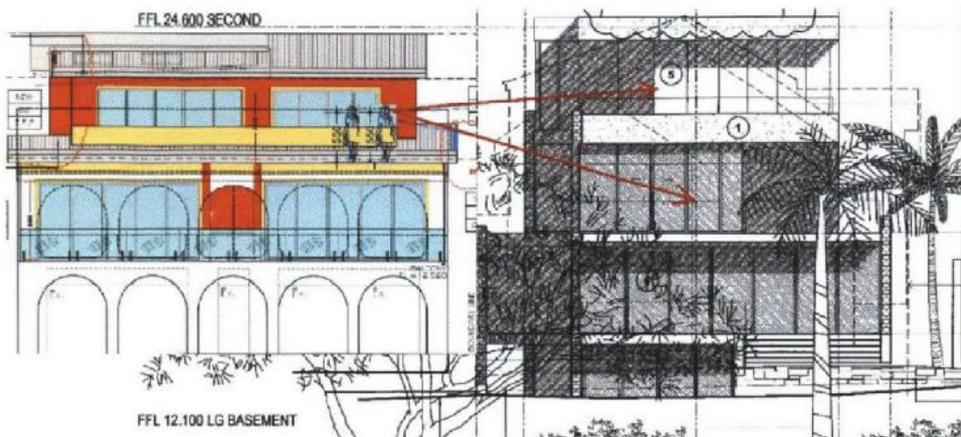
Elevated view lines to the approved north-western development on behalf of No.120 Bower Street dated 31st May 2019.
